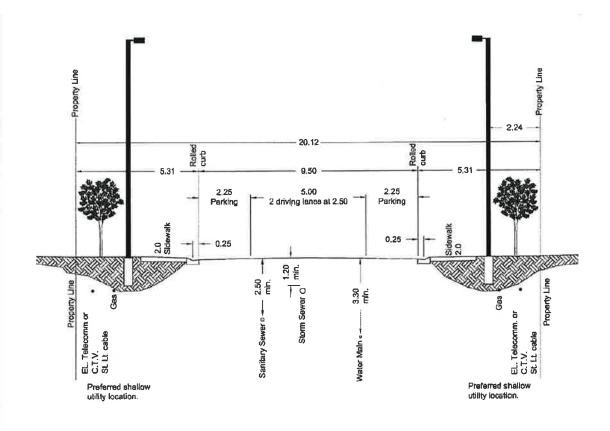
Parallel Parking Road Cross Section (as shown in the 2004 ARP)
